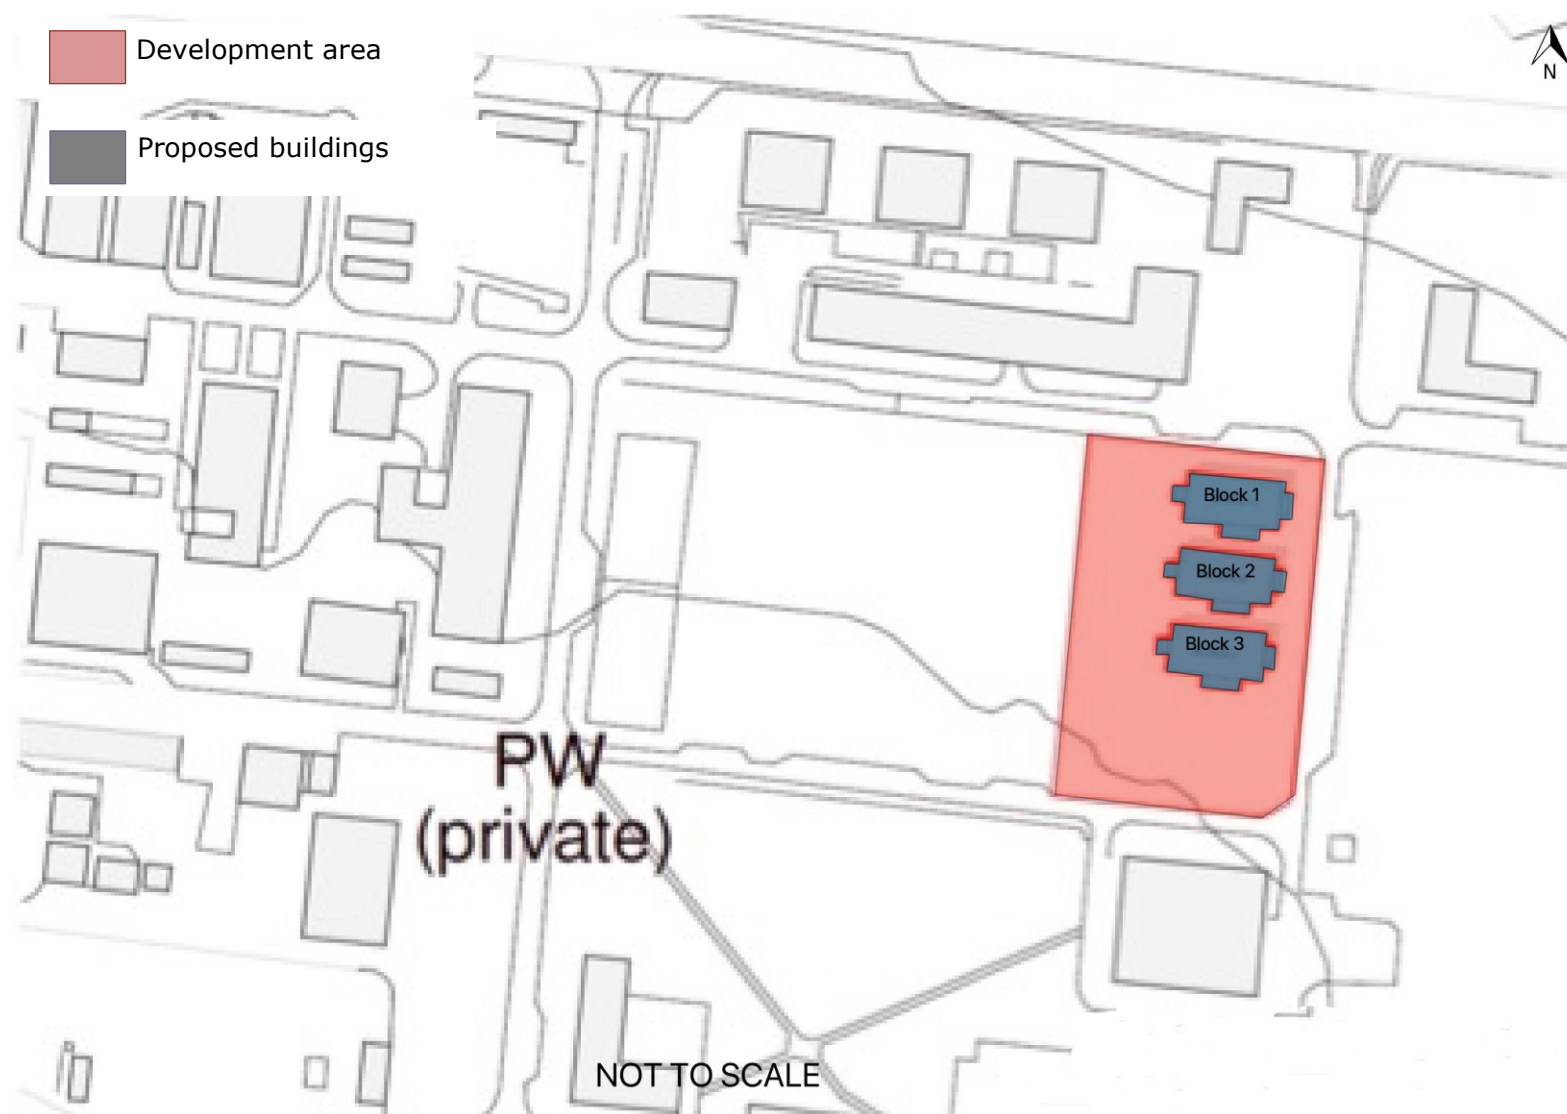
Plan of development area and proposed buildings (amended from plan supplied by client).
